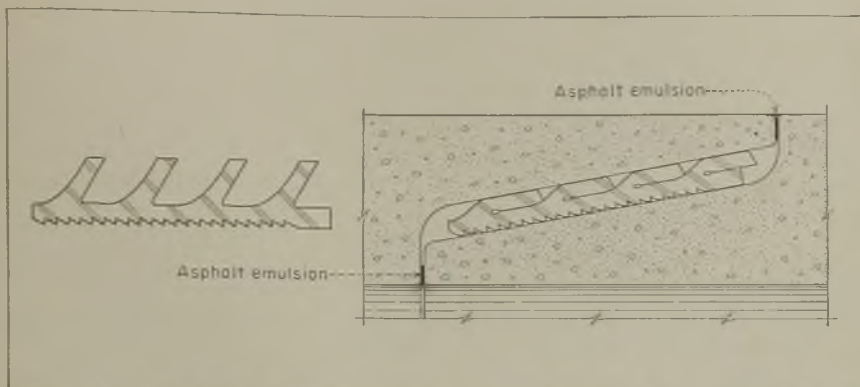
Pipe joint detail: at left, section through rubber gasket; at right, section through joint of 36-in. diameter pipe.
